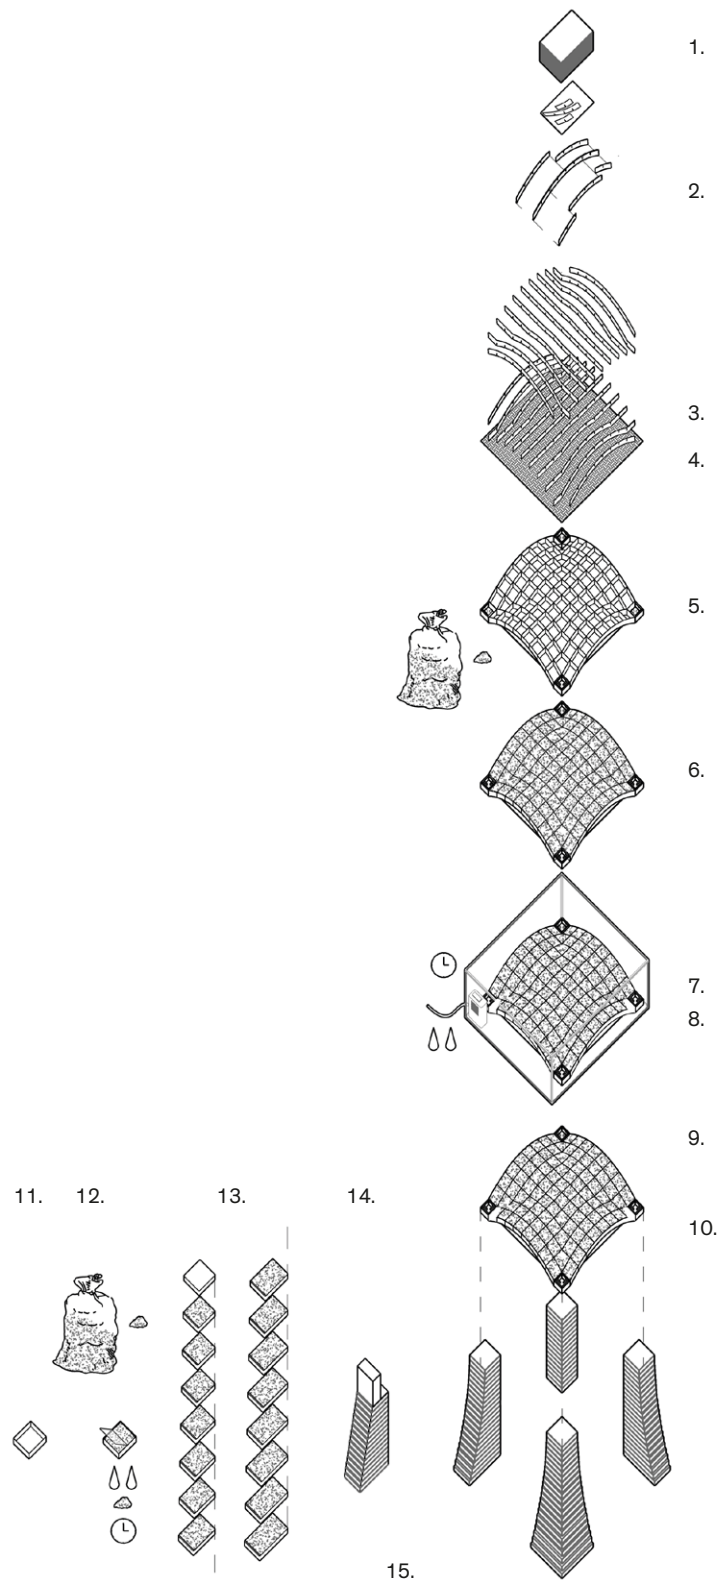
Process of cultivating the constructive system: ceiling slabs and columns
